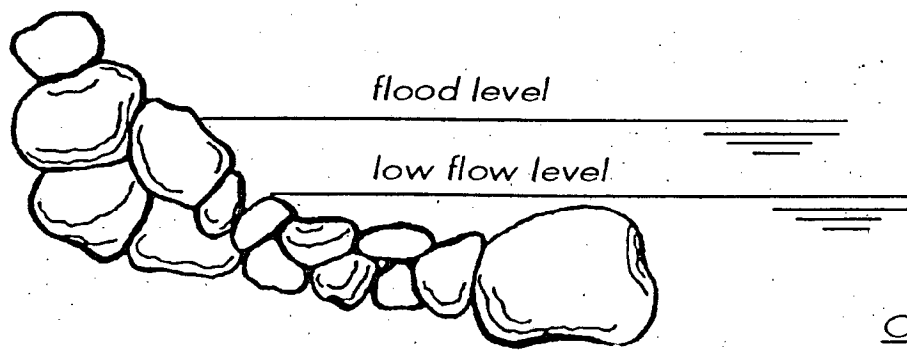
Example of a Hewlitt ramp structure. (Source: Adams and Whyte 1990)
